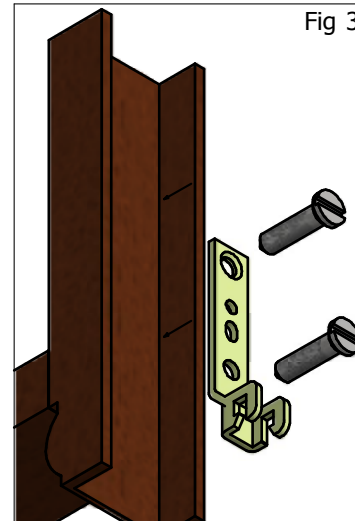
The bottom edge of the UK212 bracket must be level with the bottom of the sash or horn depending on which is applicable.
